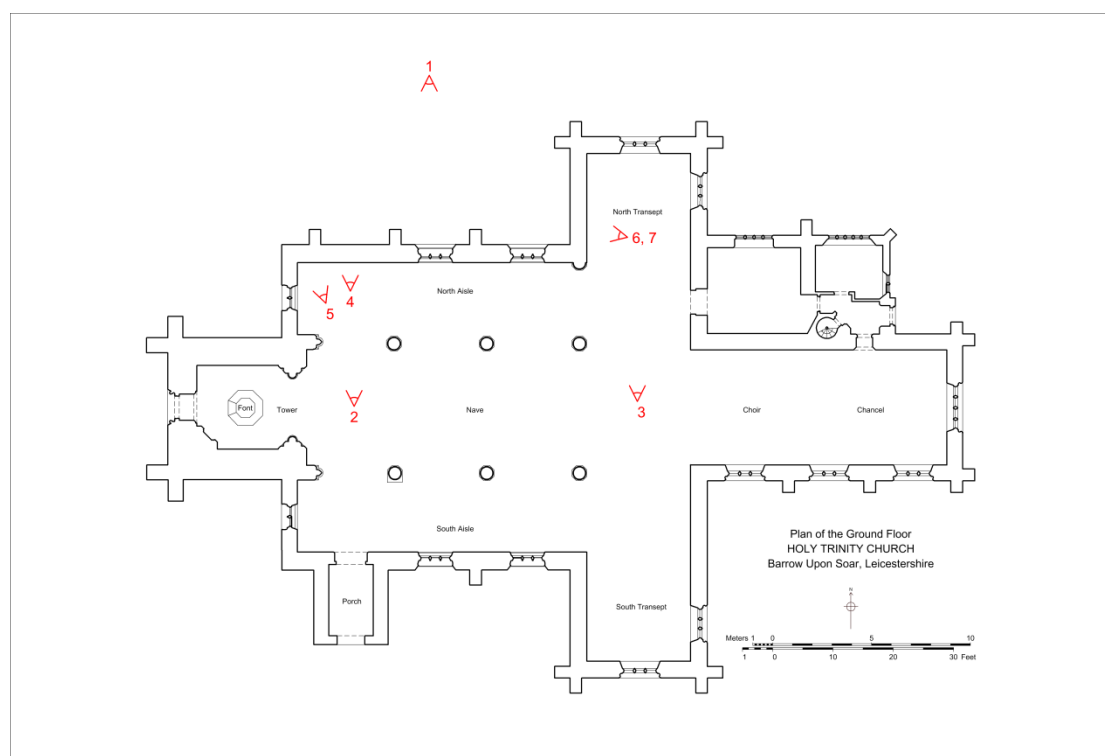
Location of plates 1-7 on the ground floor plan of Holy Trinity Church
